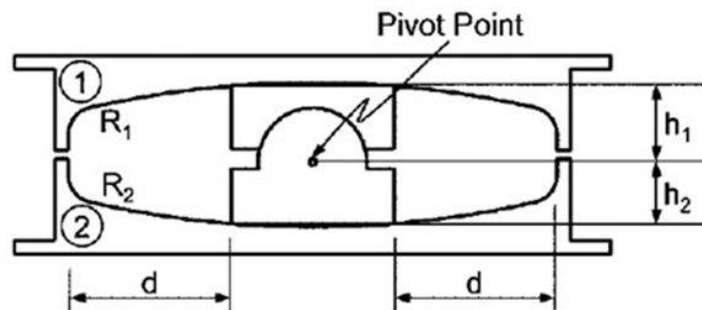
Double Friction Pendulum Bearing Cross-Section [11]
